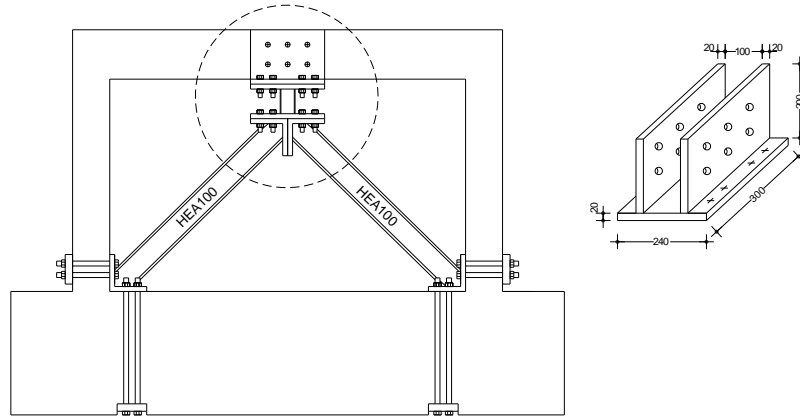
Specimens strengthened by the steel bracing system and a steel link element at the top
